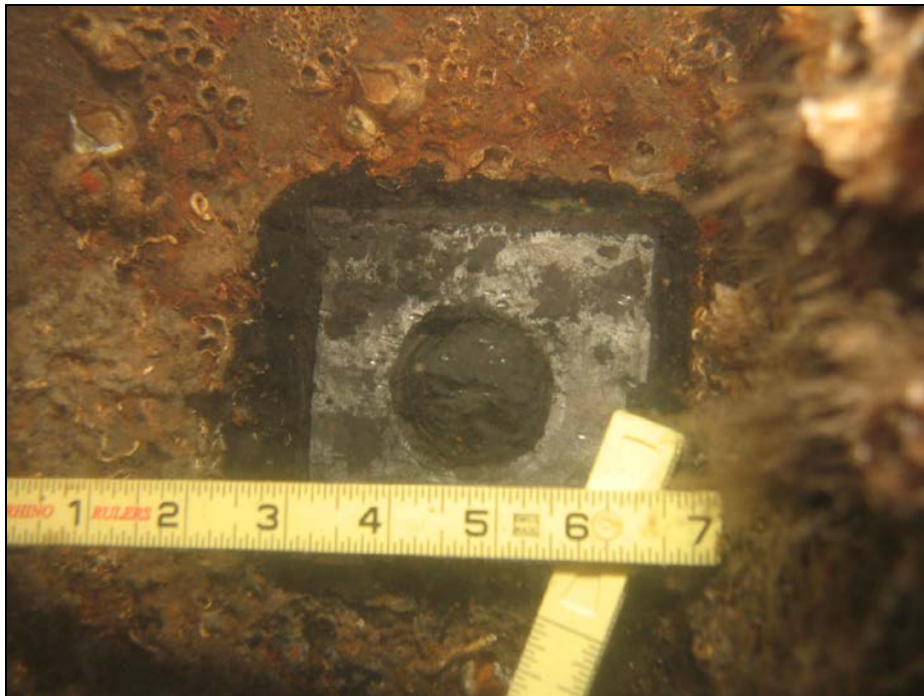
Typical underwater hardware proposed to be replaced. Note the corroded bolt head.
